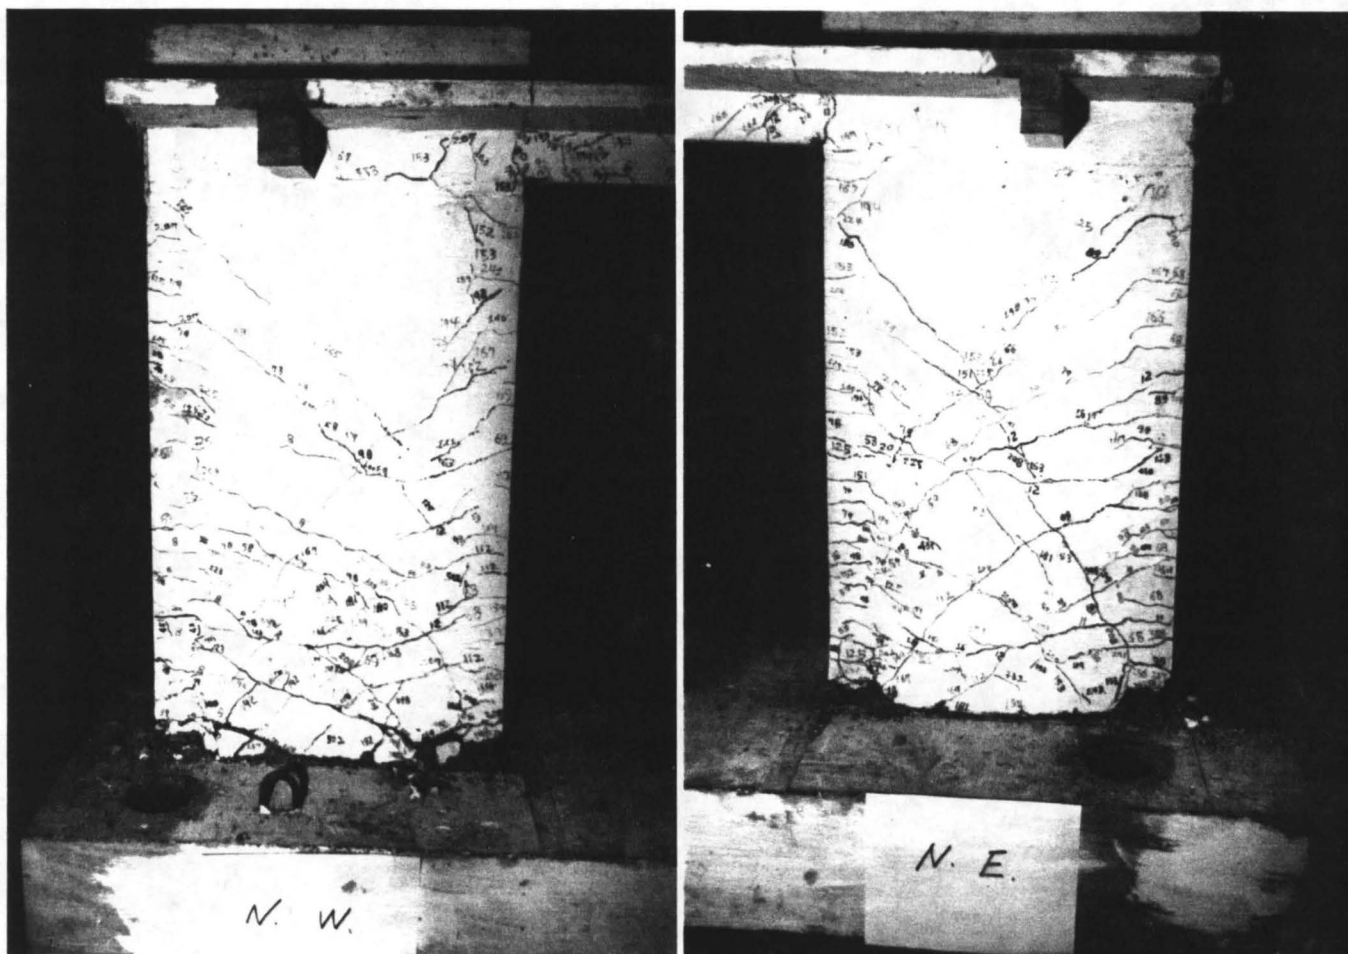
Concrete Cracks on the N. Sides of Shear Wall
